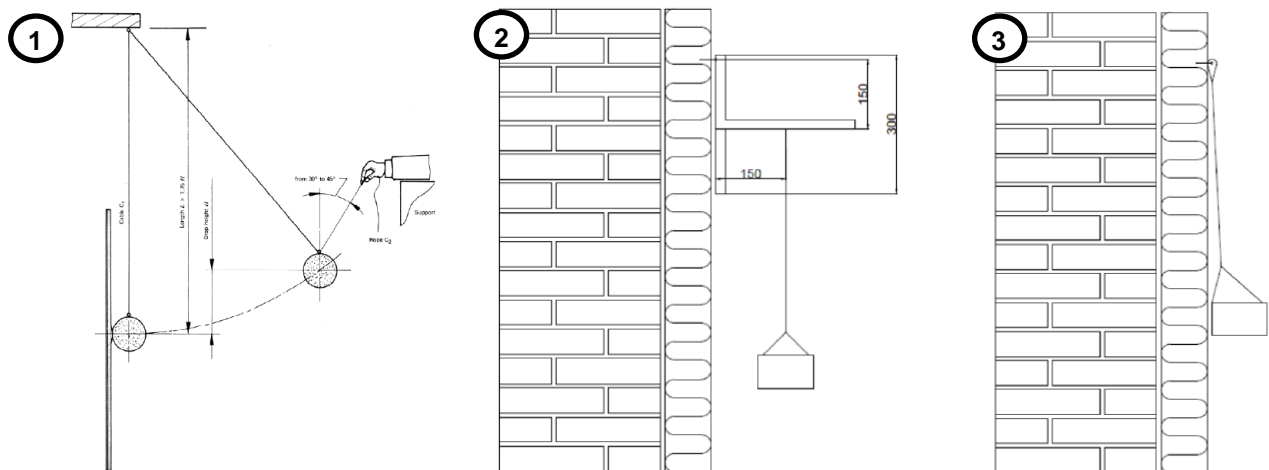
Test set-ups: 1) Hard body impact test. 2) Withdrawal test. 3) Displacement test.
